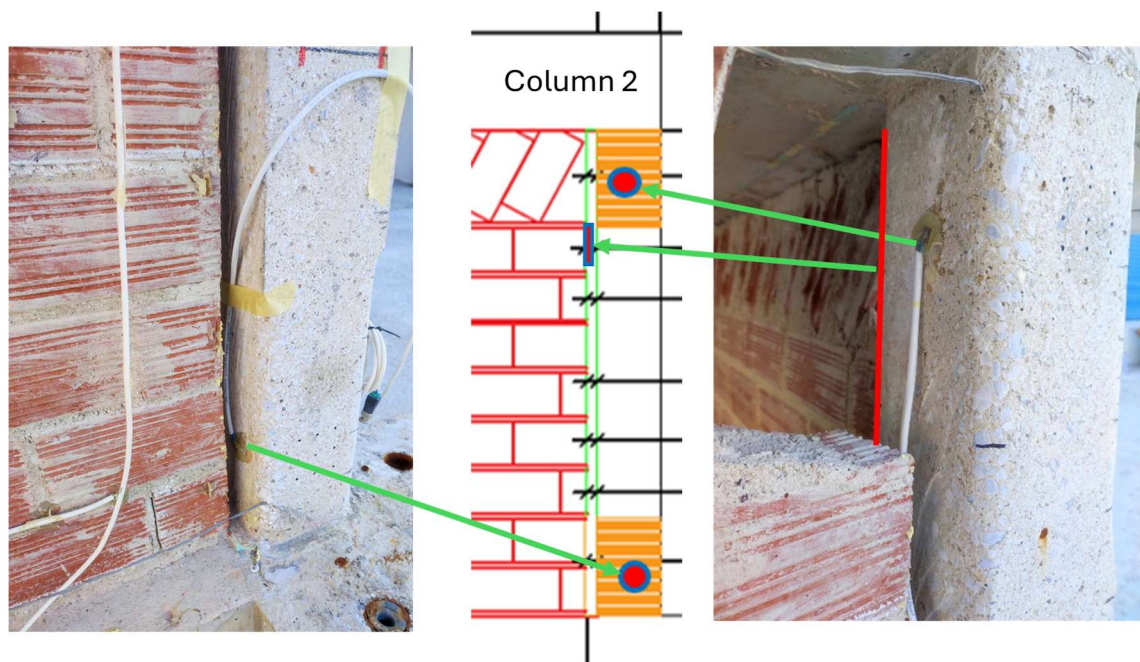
Details of the PZT patches installed at the surface of column 2 and at the surface of the infill inside the polyurethane.
